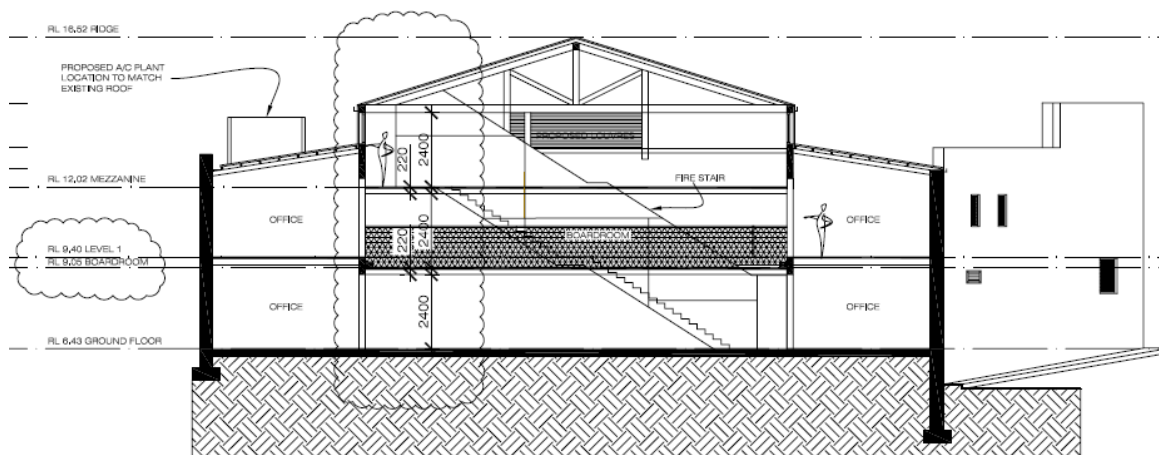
Amended plans demonstrating 2.4m between floor and under side of trusses on mezzanine
